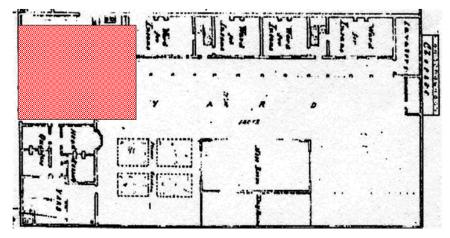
1870s plan of Yard 4 showing major structures along west wall, although buildings along the east wall also appear in old photographs. Excavations by Kostoglou (2006) are shown highlighted in red.
